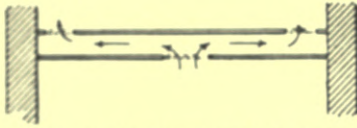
Section through Floor of Corridor, showing Passage of Heated Air
